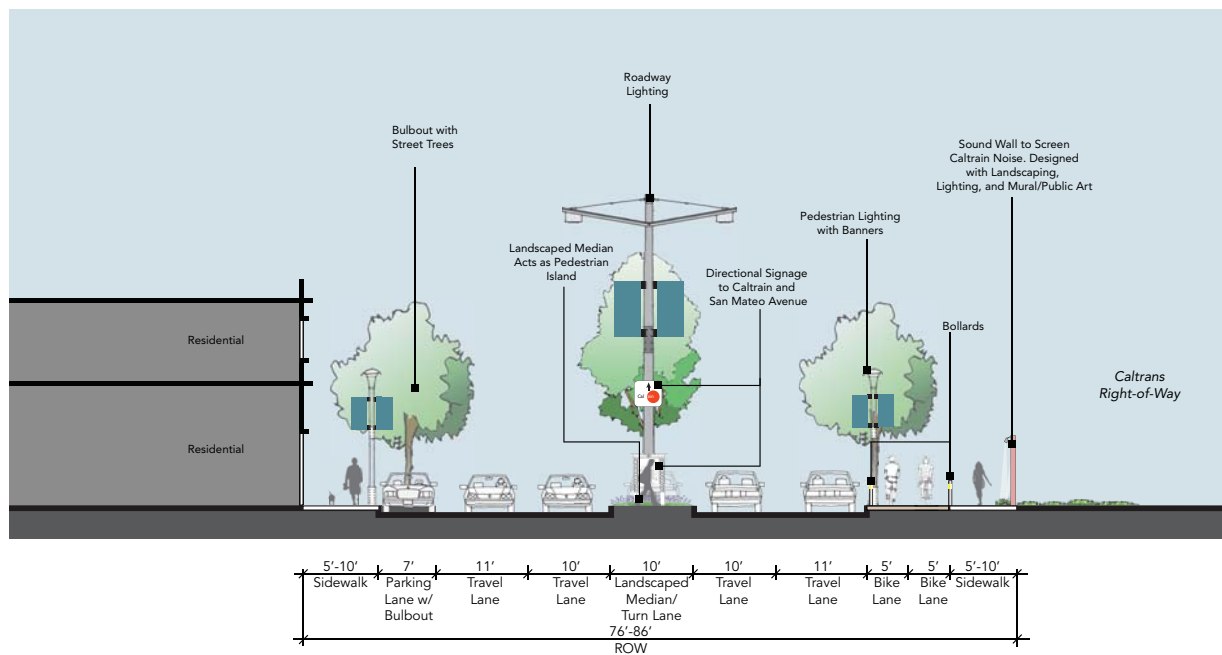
Proposed Improvements (Huntington Avenue north of San Bruno Avenue facing north)
